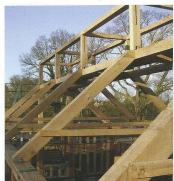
Kenilworth Castle–New timberwork for the admission building complex.
